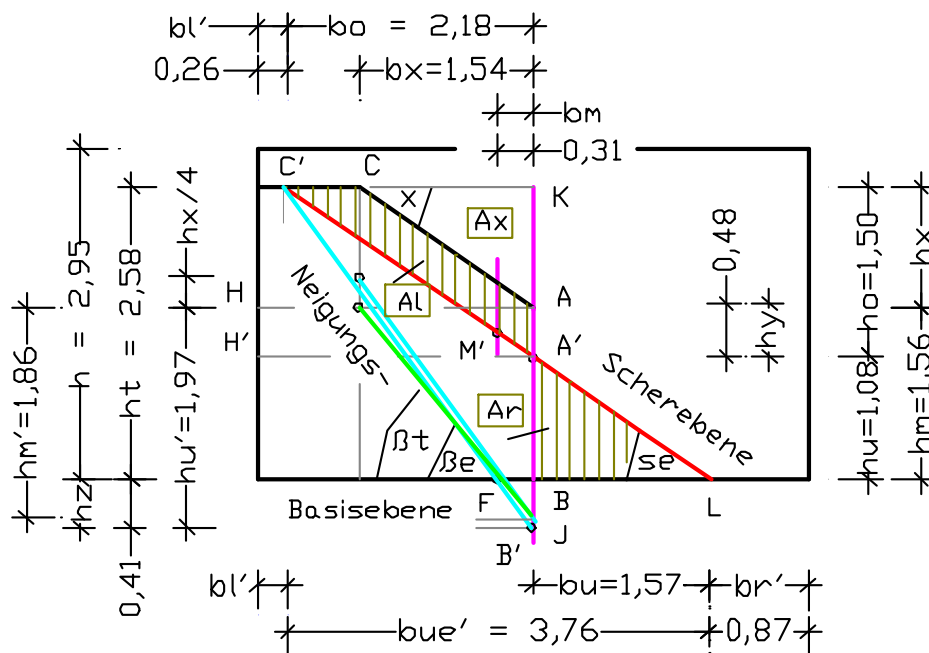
Soil load in area A_l , which slides down along the shear plane under load after losing its restraining wall on the central axis.
